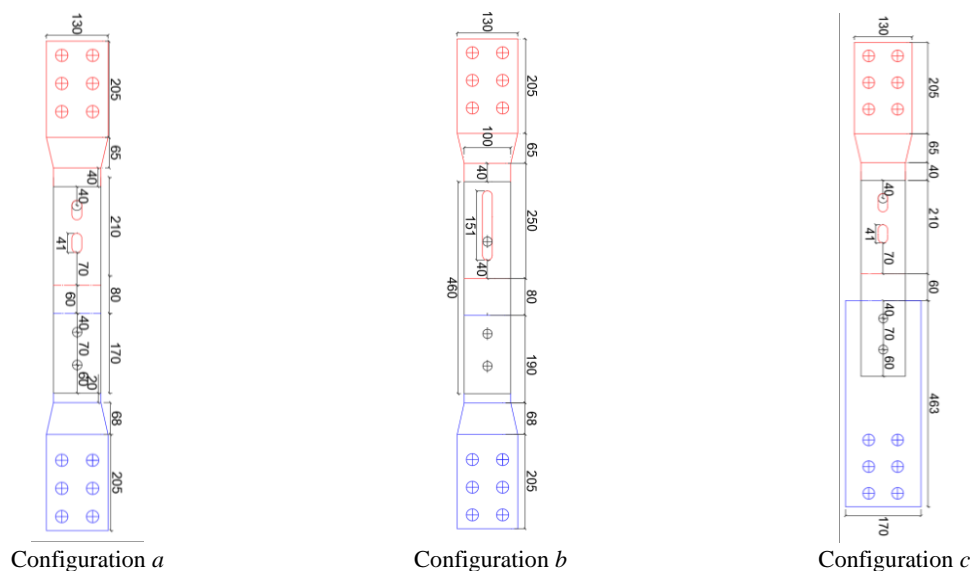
Tested specimens – Front view (dimensions in mm).
